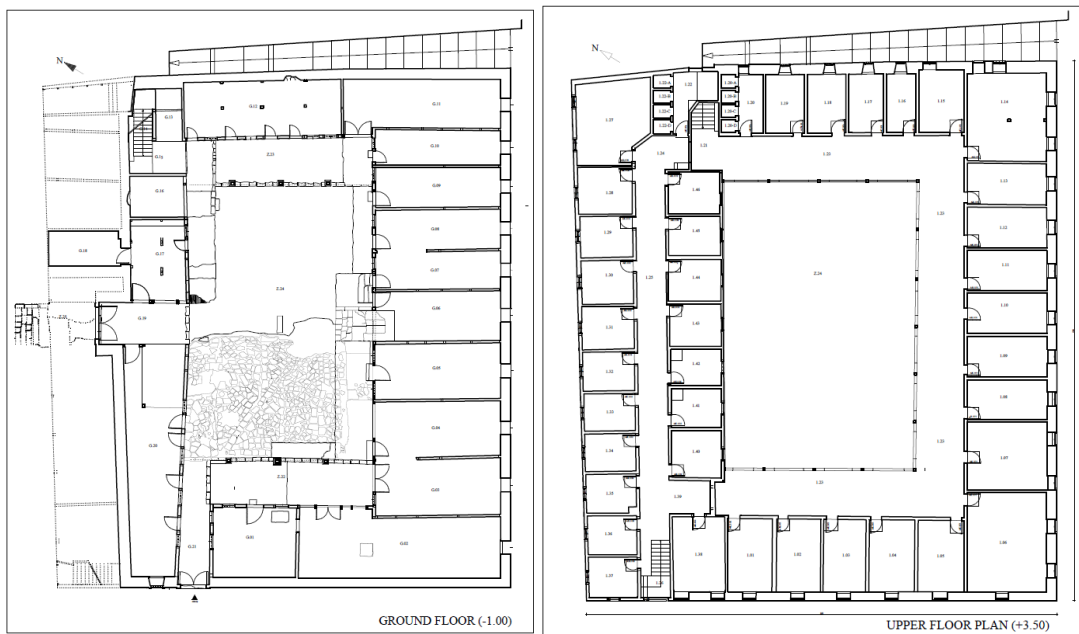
Ground floor and first floor plan before re-functioning (Processed from the project in Promim Architecture Restoration Construction Limited Company Archive)
